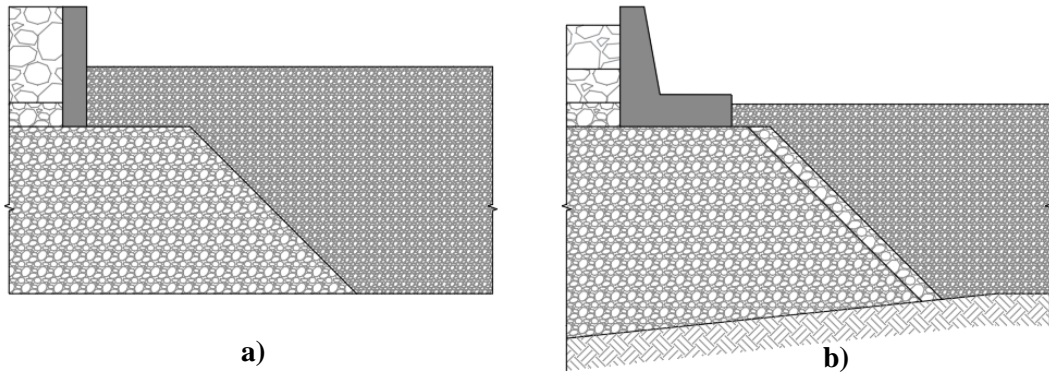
Crown wall shapes tested in; a) Yıldırım et al. (2024), b) Present study
